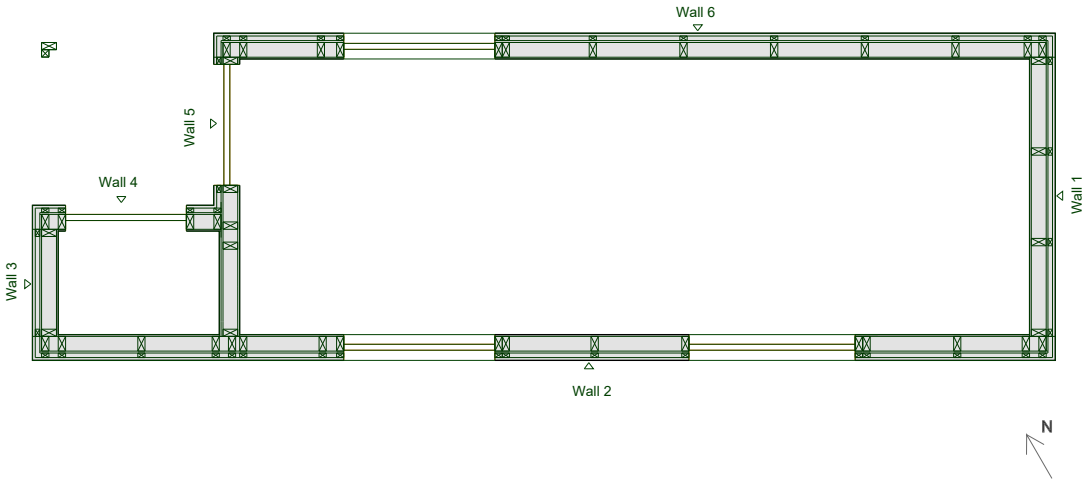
CONSTRUCTIONAL WALL'S PLAN AFTER BUILD
